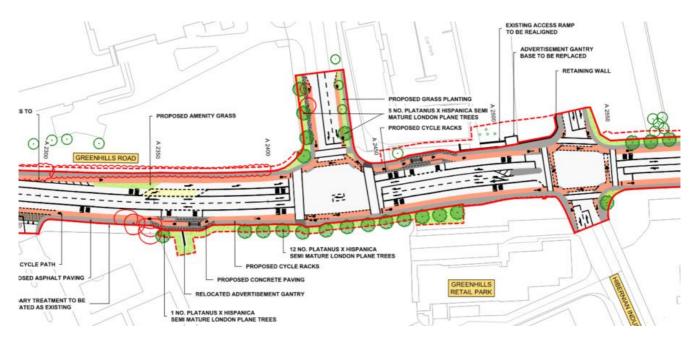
Greenhills Road proposed tree planting and amenity grass areas
